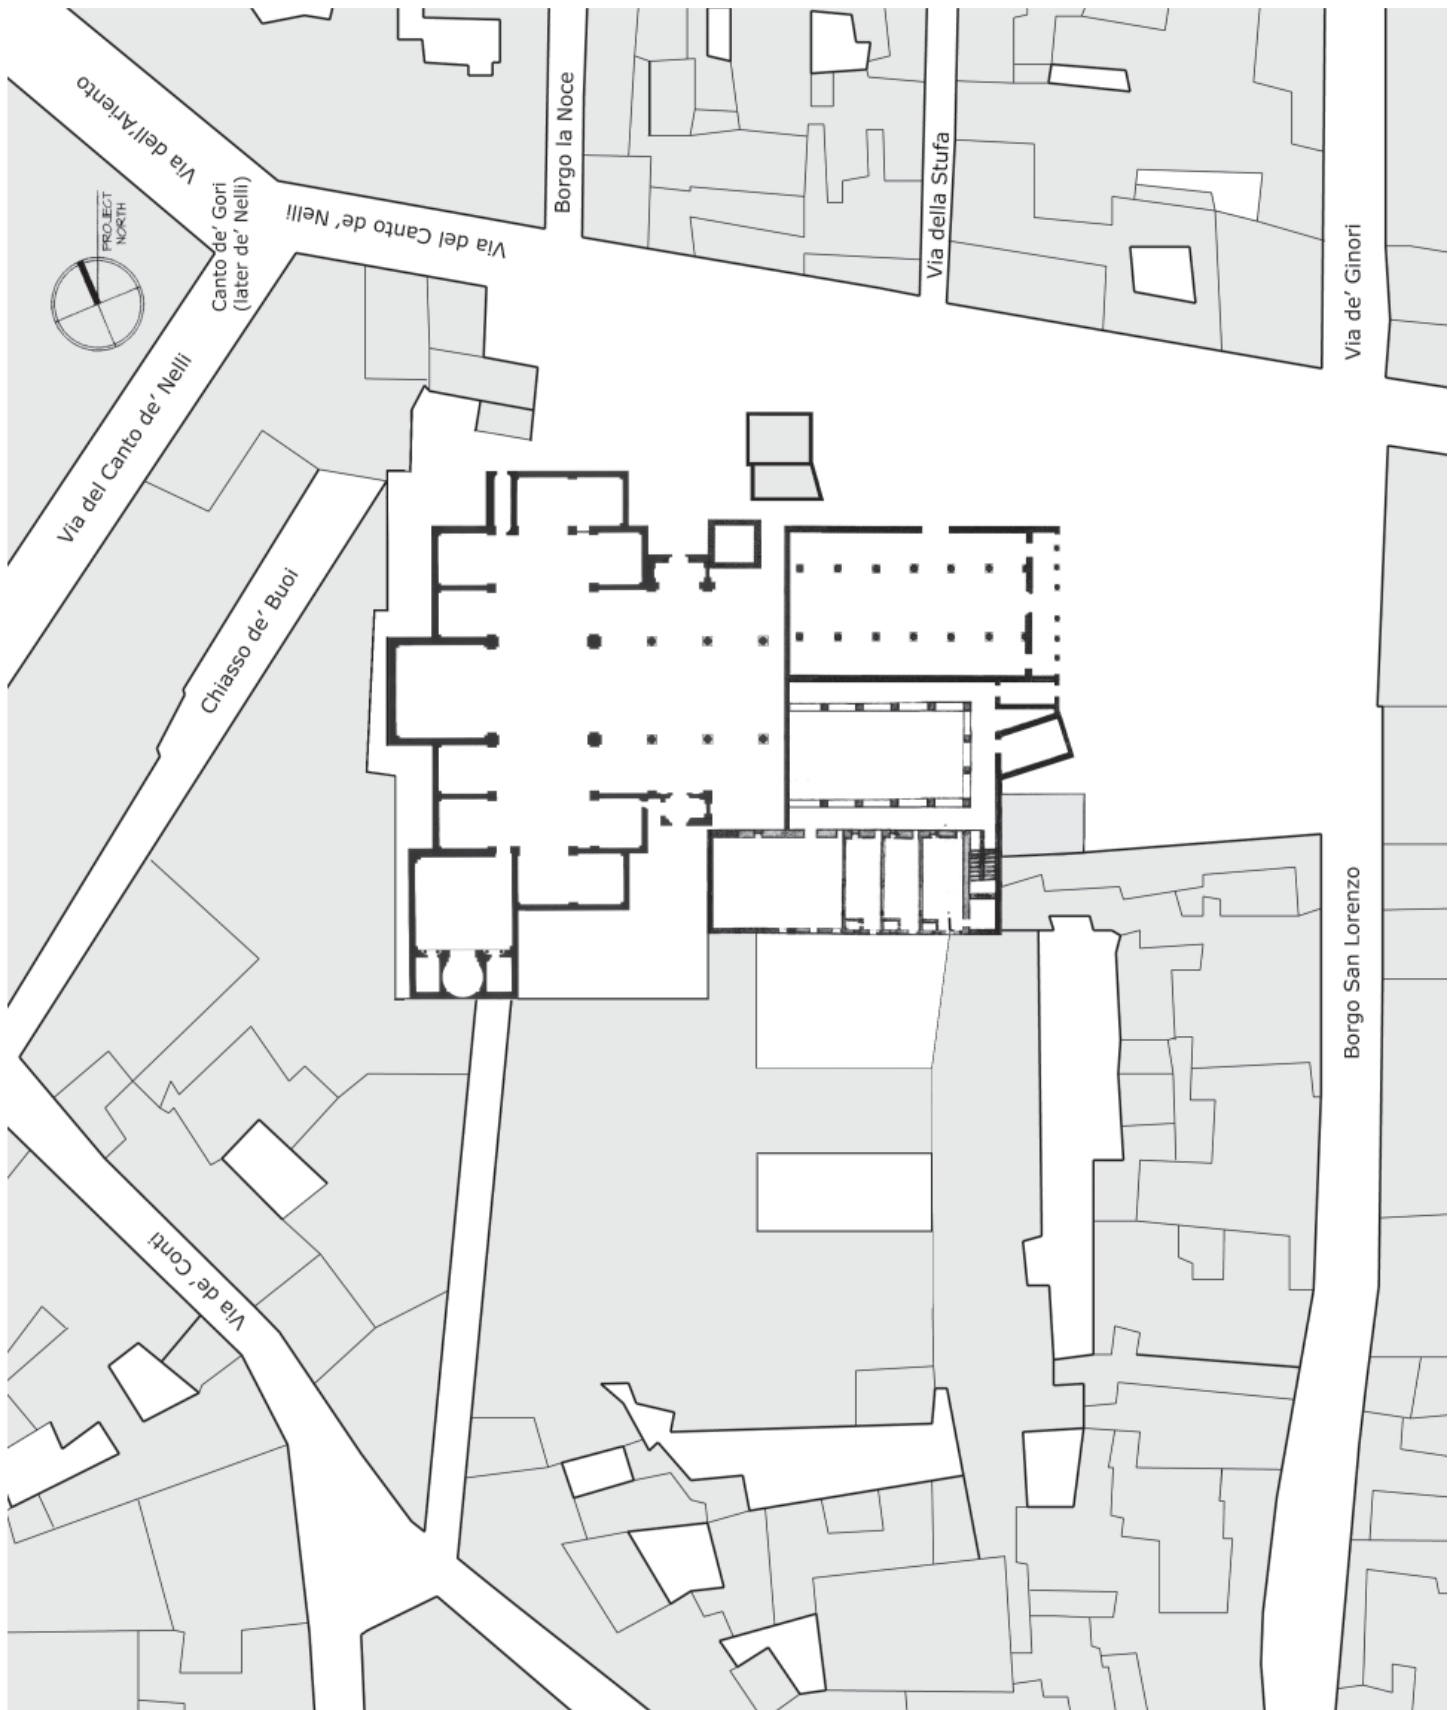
Basilica of San Lorenzo, site conditions from March 1442—May 1457, reconstruction.
